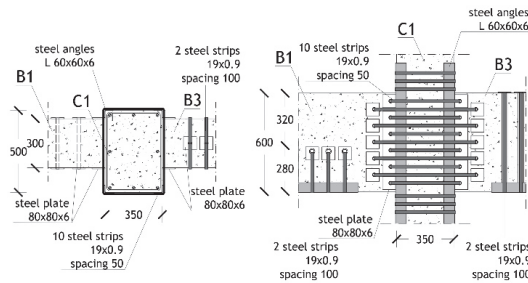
ACM-strengthened ground storey beam-to-column joint N.
